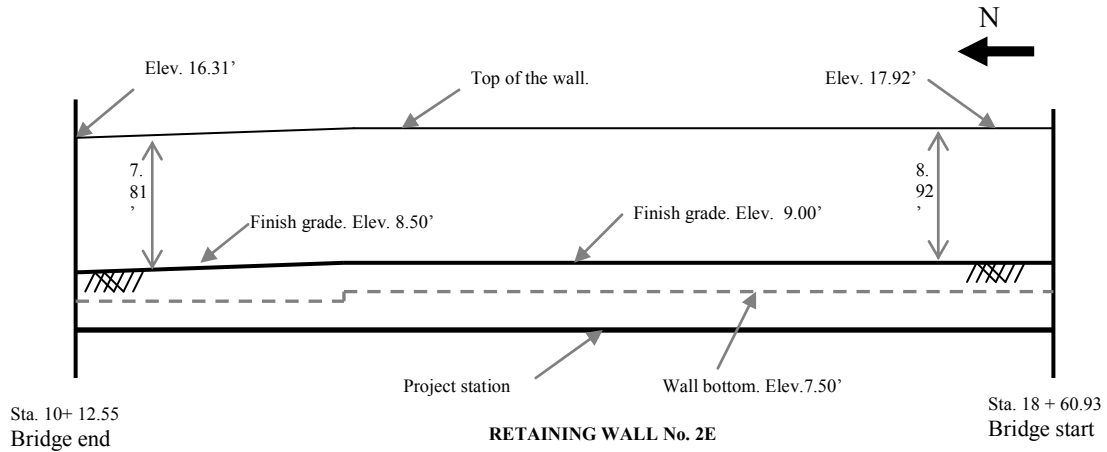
Profile of the Retaining Wall No. 2E, Not to Scale (Project 3 Drawing 22).
